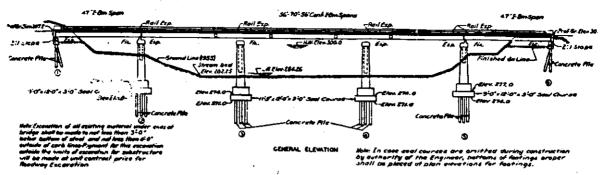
Bridge General Elevation (Old Wahite Ditch Bridge).
